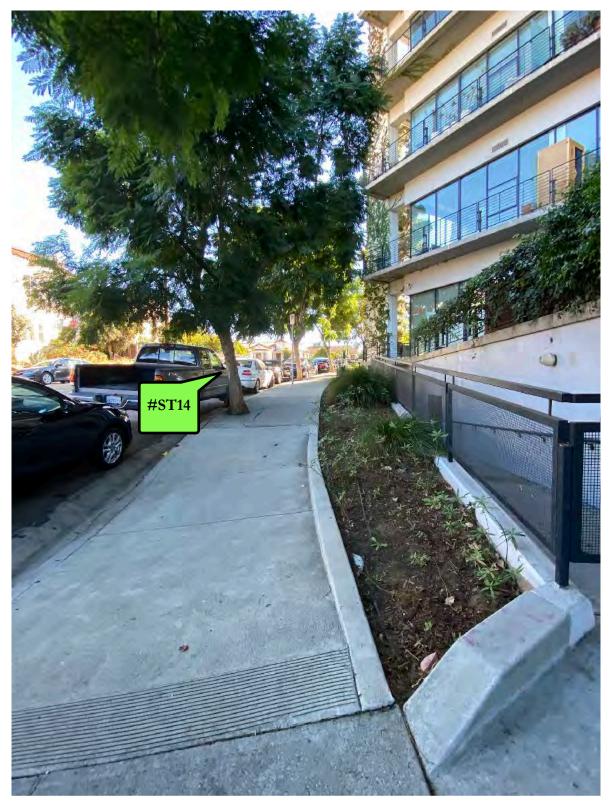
Street Tree Jacaranda #ST14 - To be retained and protected in place - note it is next to this previous driveway ramp for reference of location.
